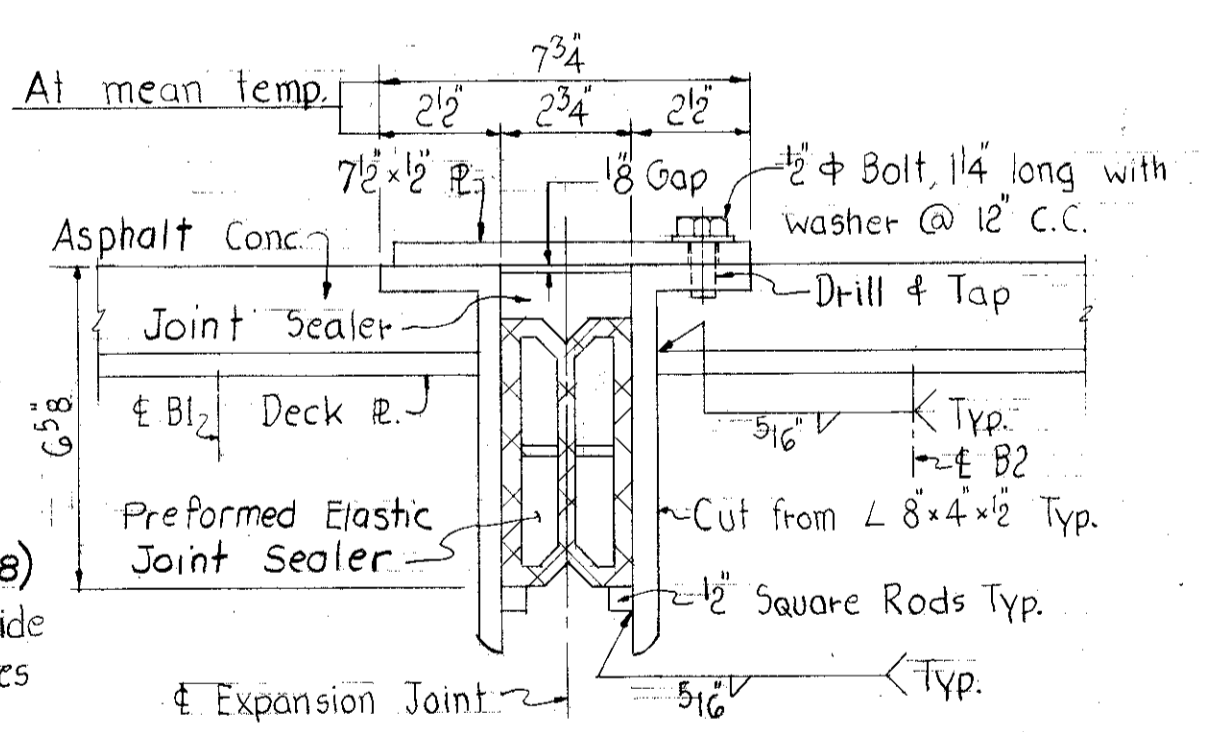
DETAILS OF DECK, APRON, CURB PLATES & EXPANSION JOINT
